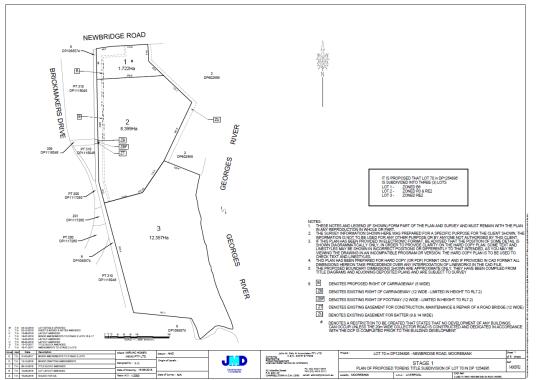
Three (3) lot subdivision in Stage 1 subdivision of 146 Newbridge Road, Moorebank
